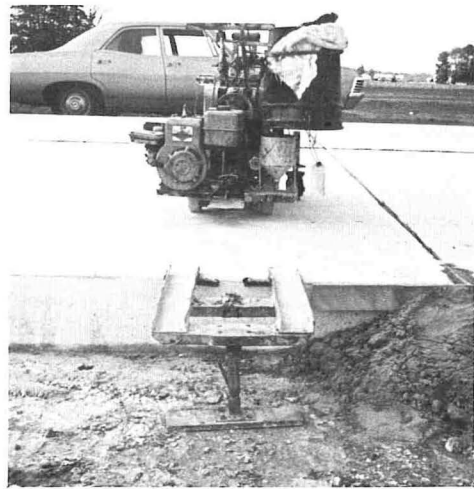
Fully automatic Compress-Eject machine with edge ramp.
